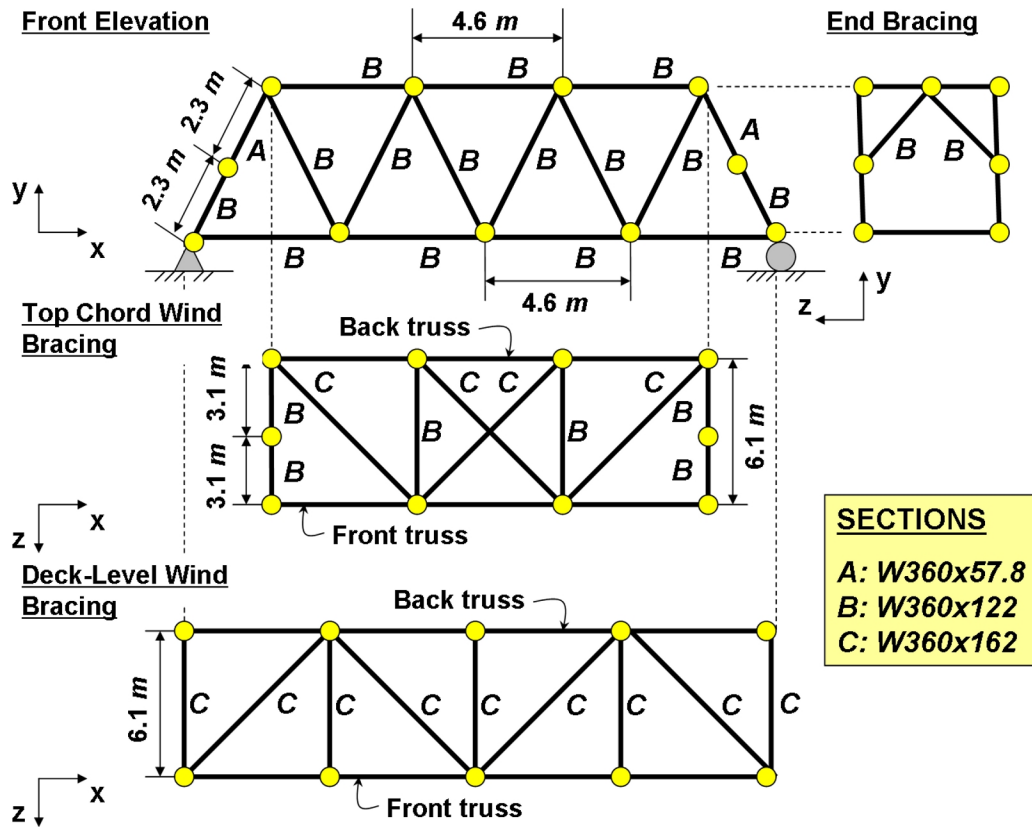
Through-truss model setup, with ASTM-A36 steel wide-flange members consisting of W360x57.8 (W14x38), W360x122 (W14x82), and W360x162 (W14x109) sections and one blast beam-column element assigned per member.
